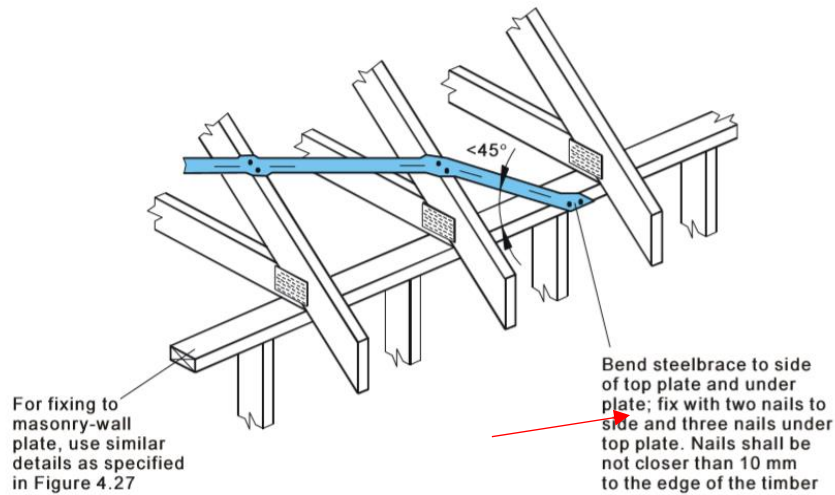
END FIXING DETAILS AT HEEL—TO TOP PLATE
